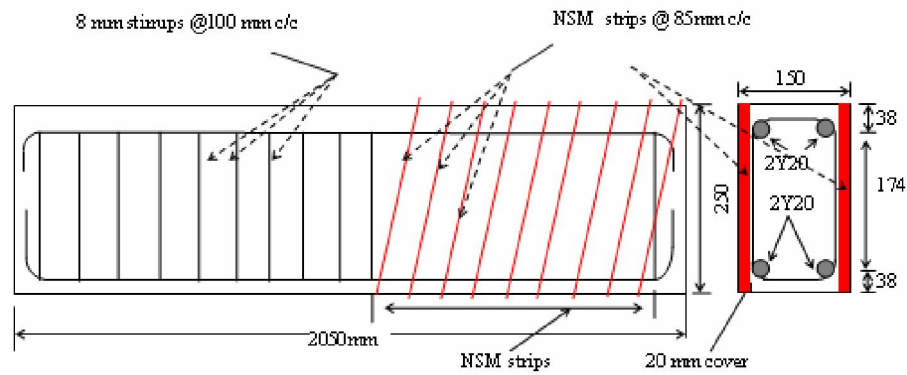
Arrangement of NSM steel strips in beam (S1)
